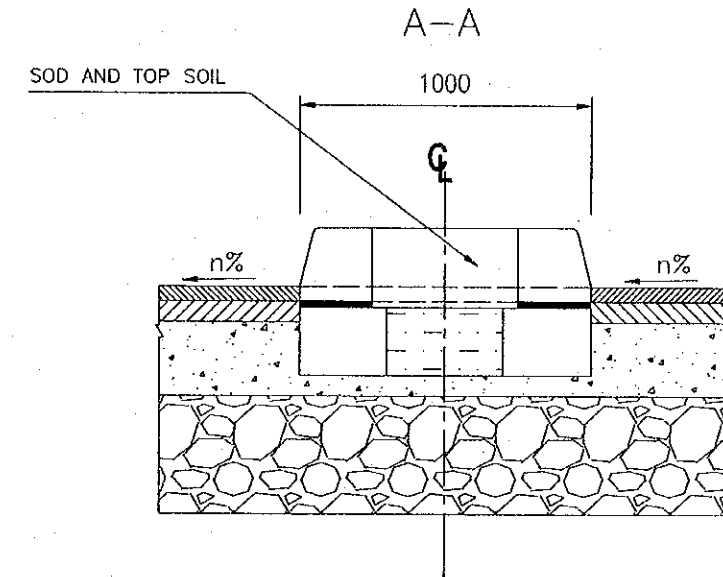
DETAIL OF MEDIAN OPEN FOR DRAINAGE
